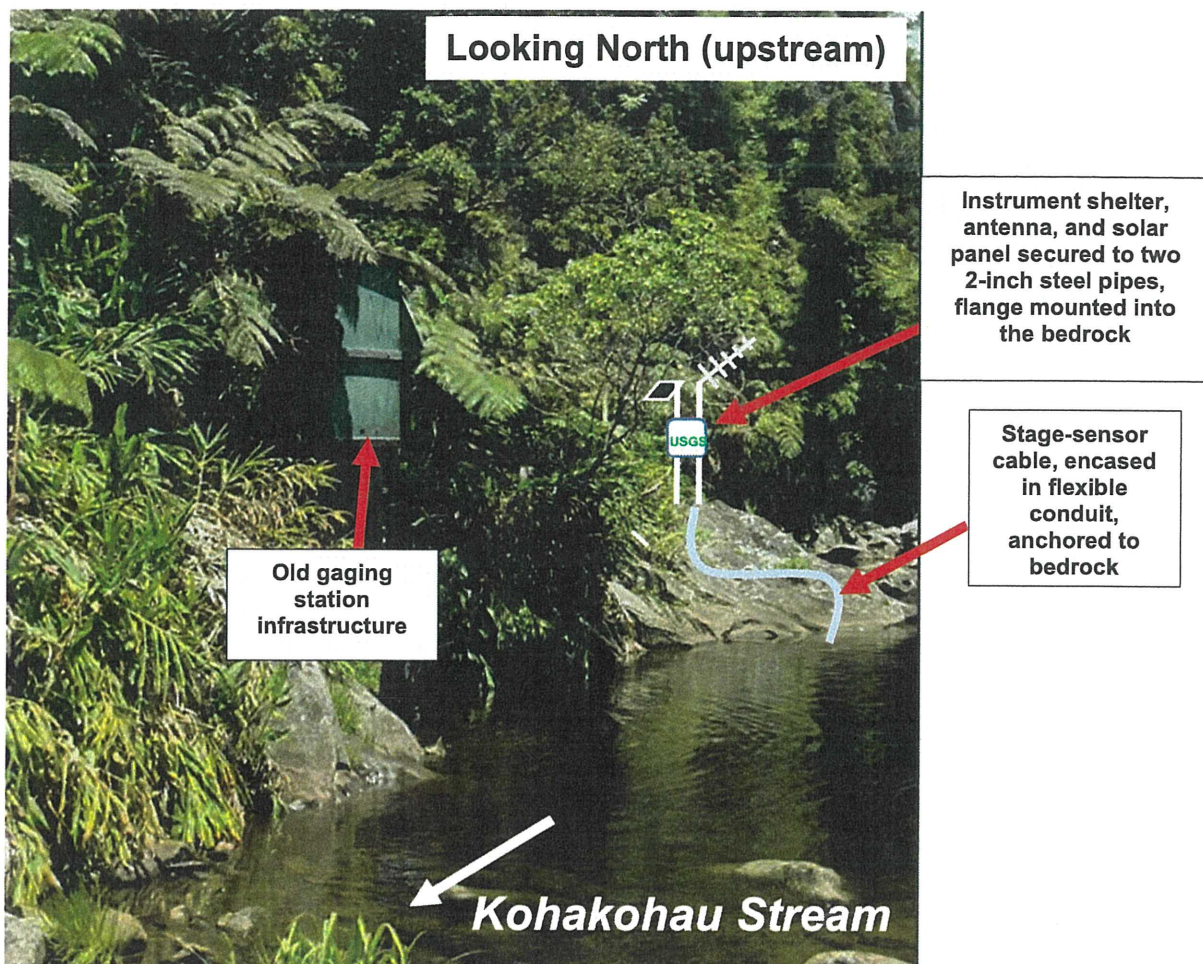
Schematic of proposed streamflow monitoring station on Kohakohau stream looking north (upstream). The instrument shelter will be a 24x16x9-inch fiberglass instrument enclosure containing a 12-volt sealed-lead-acid (SLA) battery and an electronic data logger with satellite telemetry. The instrument shelter, antenna, and a 12x12-inch 10-watt solar panel will be all be secured to two 2-inch steel pipes, flange-mounted into the bedrock using $\frac{1}{2}$ -inch concrete anchor bolts. An instrument cable encased in 1-inch diameter flexible conduit will run along from the enclosure to a sensor in the stream, anchored along the way with galvanized straps and $\frac{1}{2}$ -inch concrete anchor bolts securing the conduit to the bedrock. The old gaging station infrastructure is no longer safe for USGS staff to work on. USGS staff will work to remove the old infrastructure during the installation of the new monitoring equipment if possible. There will be no grading or grubbing of the streambank and no excavation or filling in the channel. All materials will be removed at the end of this project, with an indefinite timeframe.
